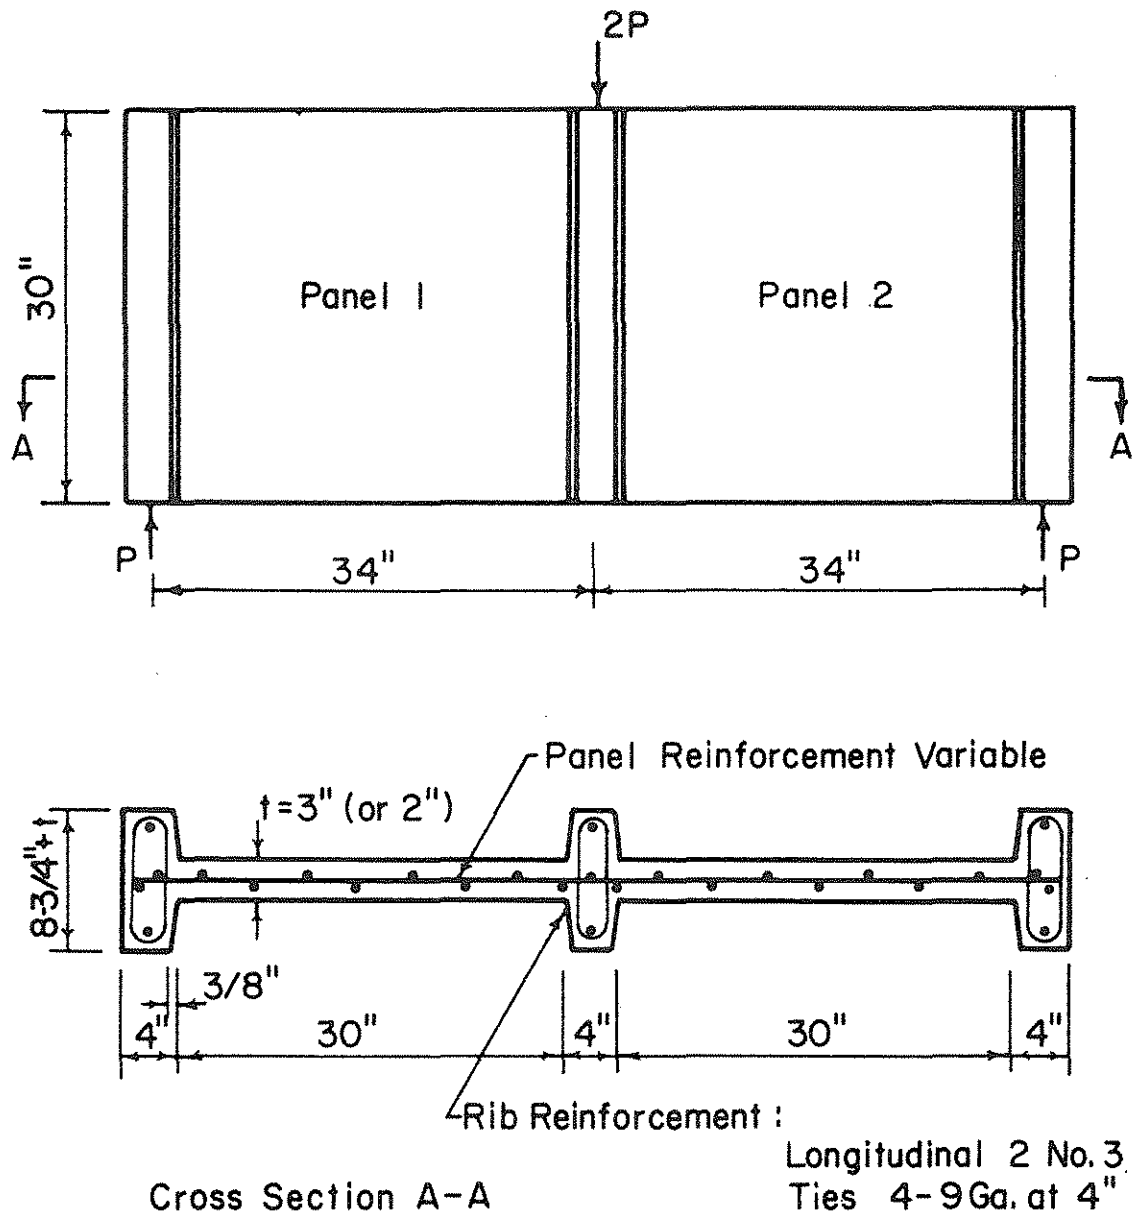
Shear Panel Test Specimens, W-1, W-2, W-4 (8)
